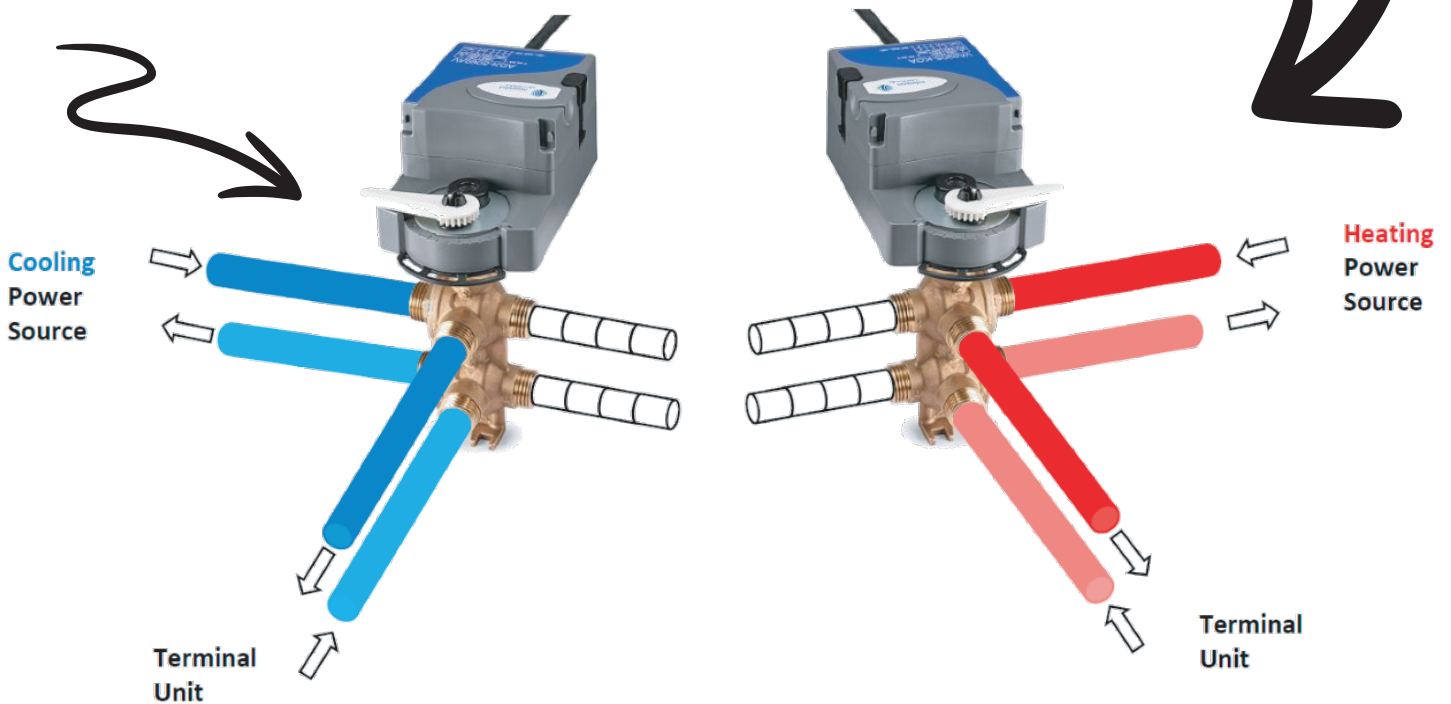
Single 6-Way Valve that Handles Four Pipe Applications Without a Changeover Valve
